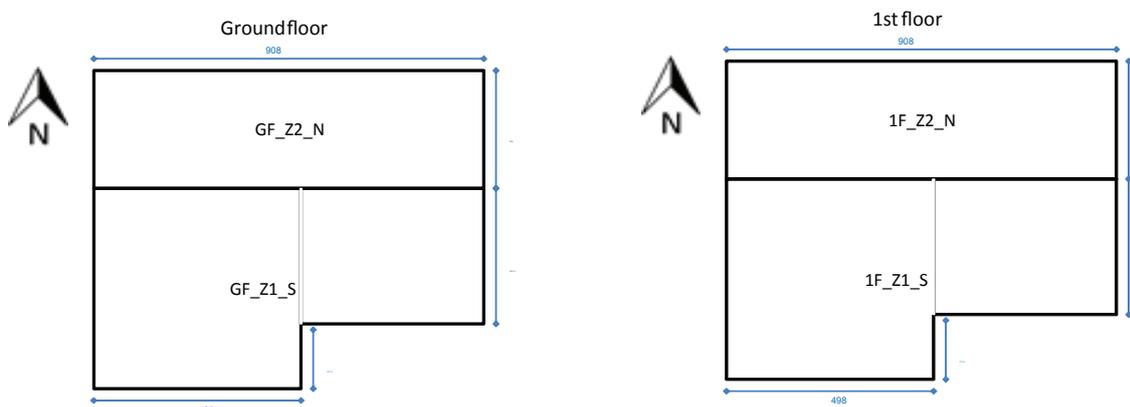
Floor plans (ground floor, 1st floor) with the simulated zones of the single family house
